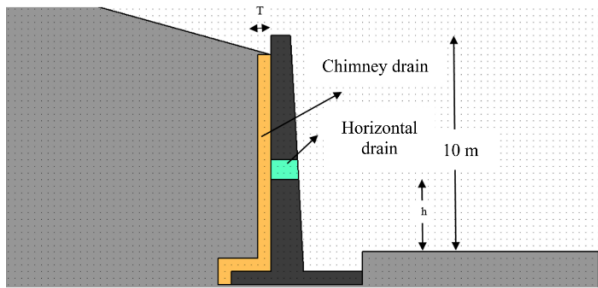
Retaining wall with a height of 10m including a chimney and a horizontal drainage system
